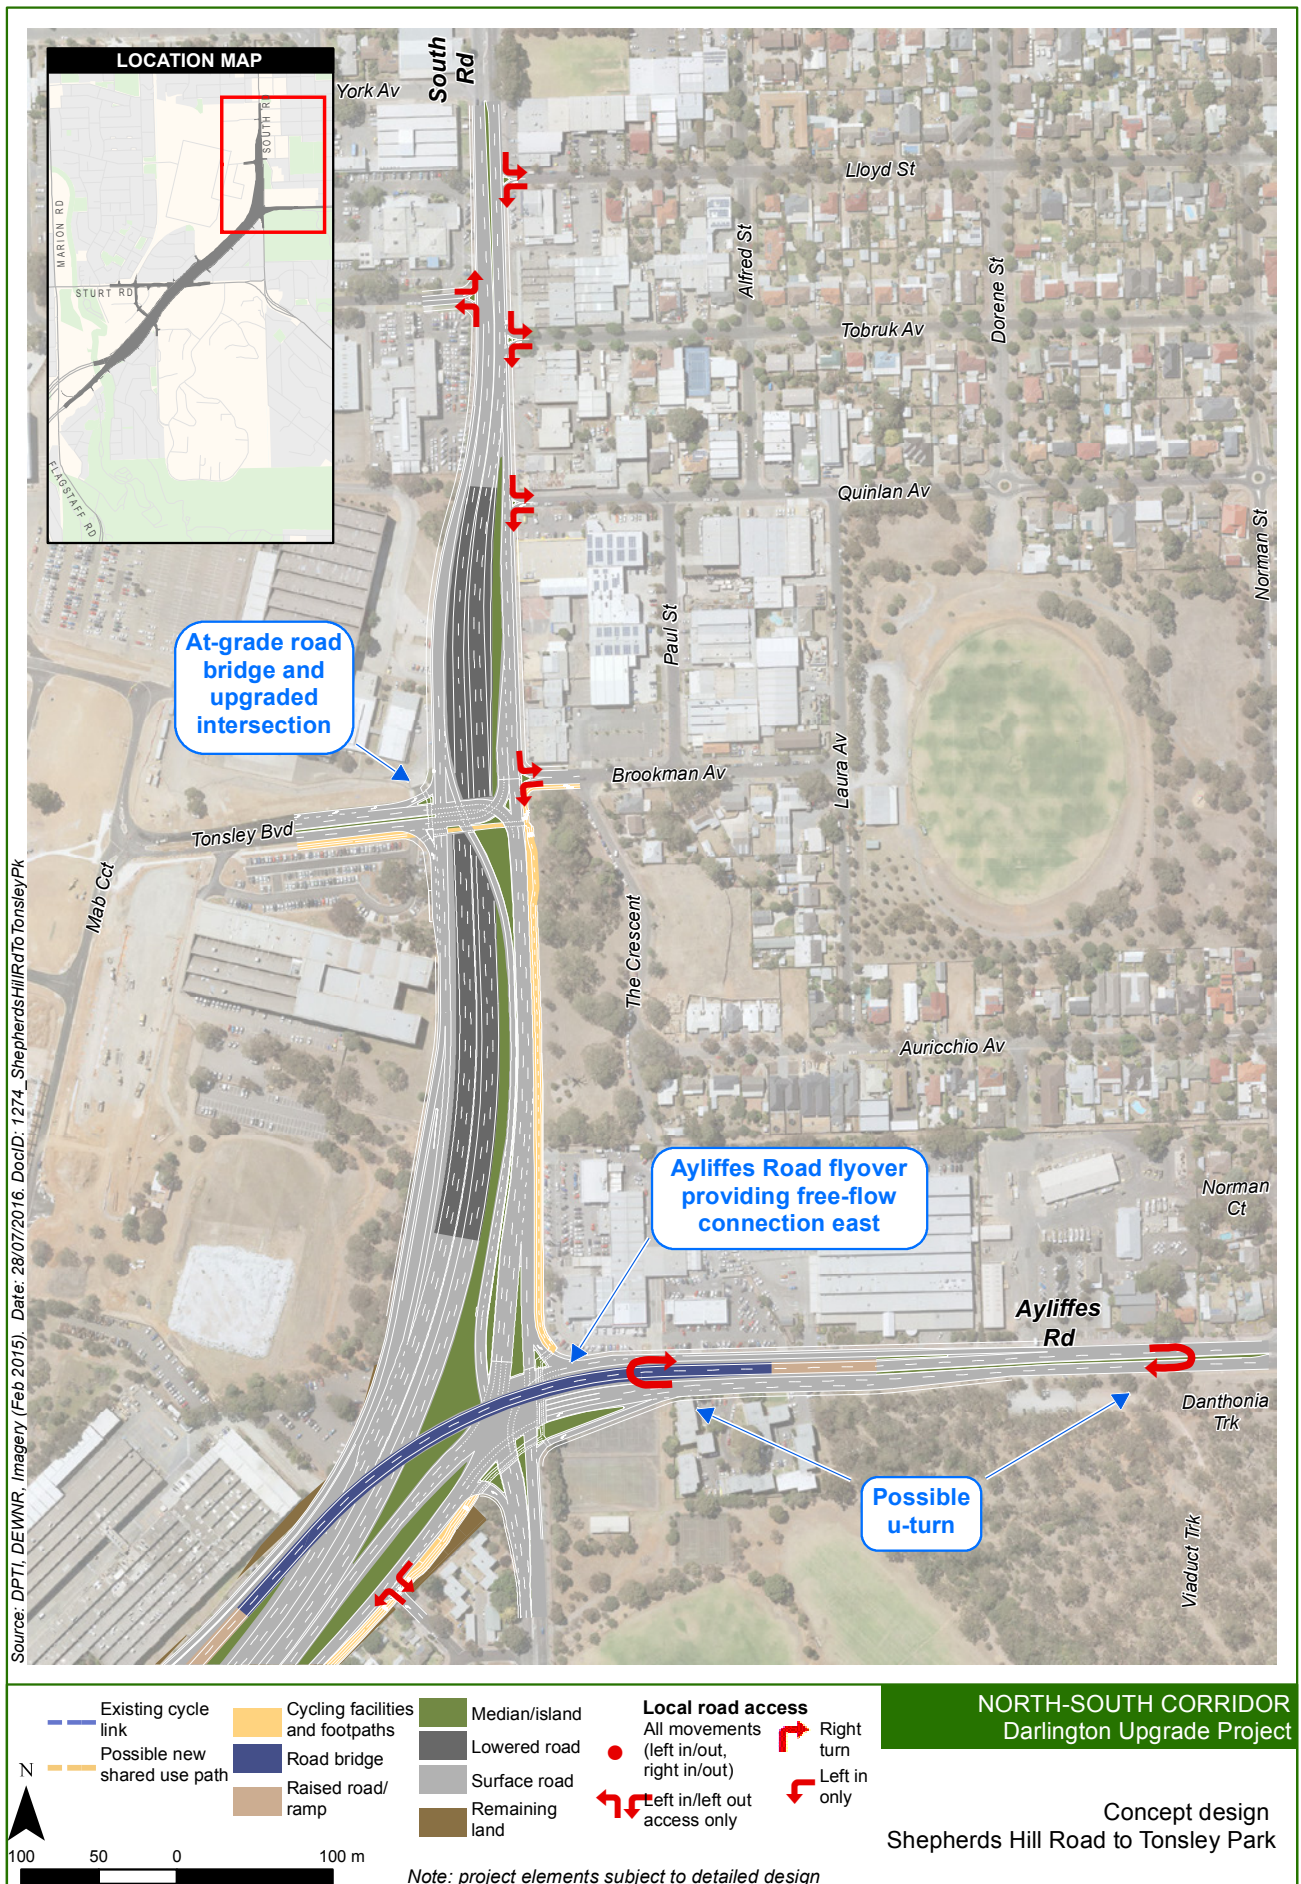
Darlington Upgrade Project – Shepherds Hill Road to Tonsley Park
